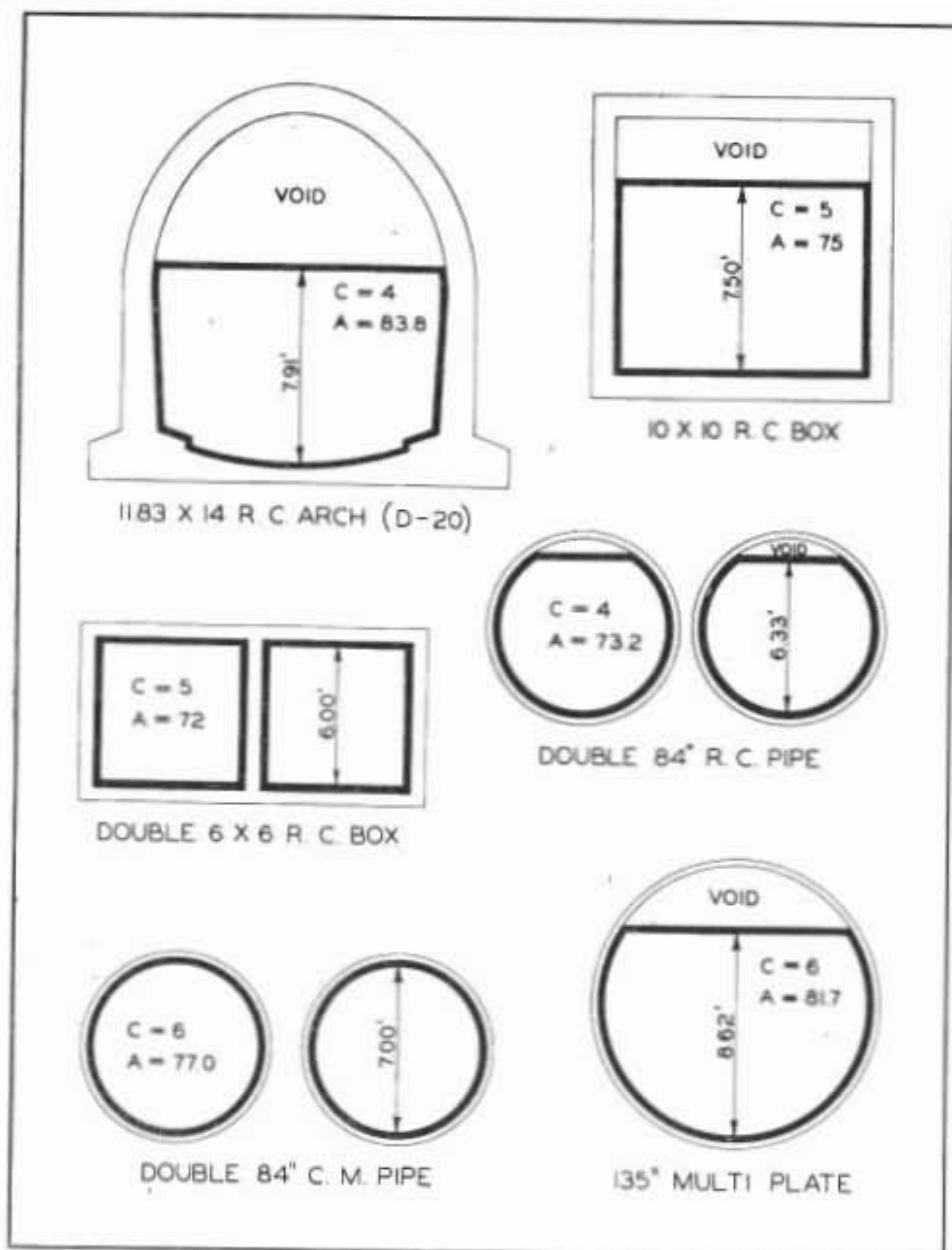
Application of rated waterway limitation to typical free-outlet culvert sections
